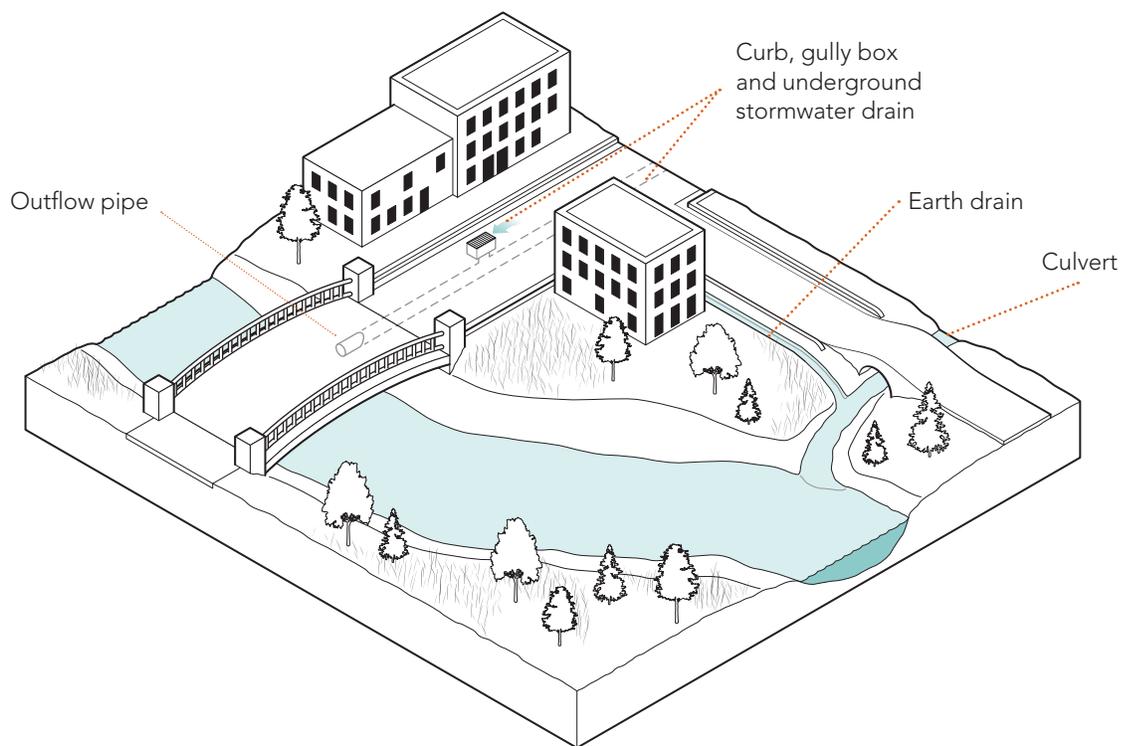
ENGINEERED DRAINAGE SYSTEMS
